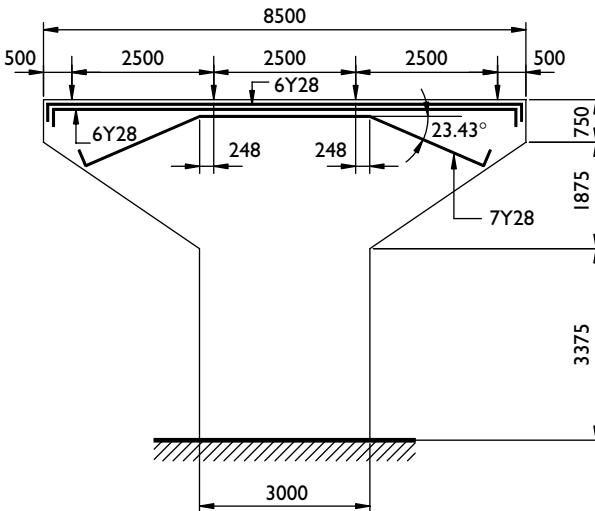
Layout of main steel reinforcement in the bridge pier.
